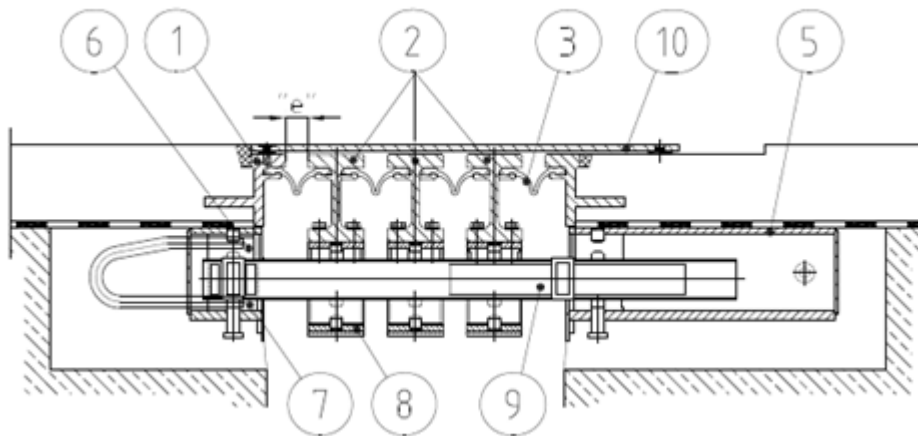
Cross section at footpath with crossbeam of single crossbeam modular expansion joint with shear control elements under centre beams and cover plate
